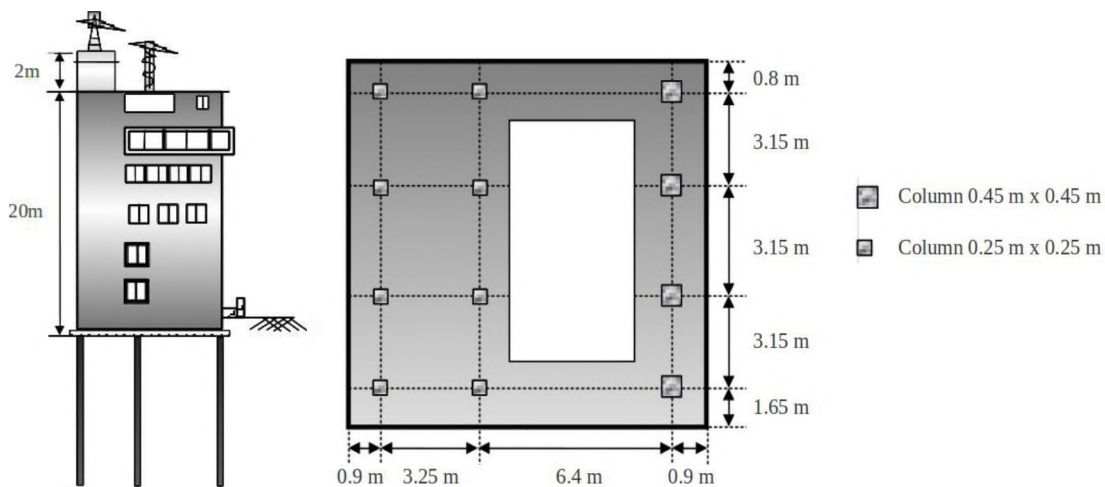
Elevation of port building, Dimensions of the Kandla Port Office Building and column details of port building
